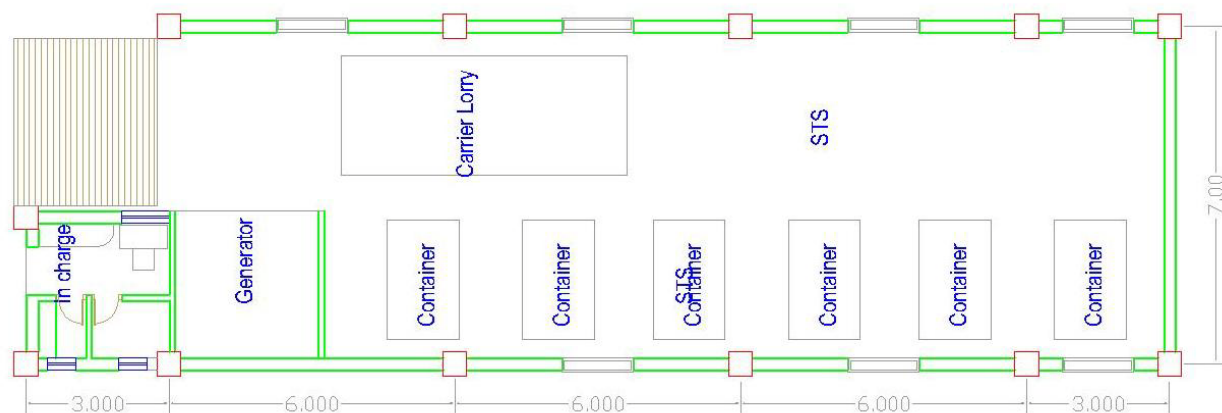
STS – 2 Nazir Ahmed Road Andarkilla Layout Plan (22°20'25"N, 91°50'8"E)
